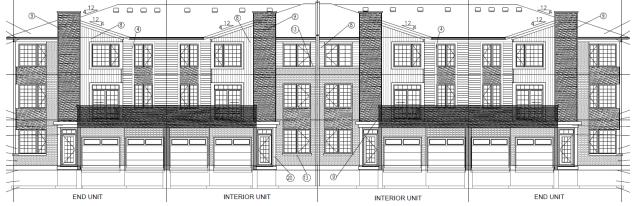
Elevation of the three-storey back-to-back townhouses facing Asher Crescent
